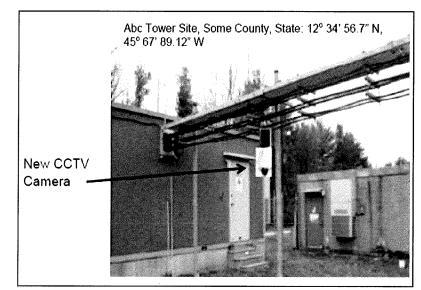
Ground-level photograph with graphic showing proposed equipment installation.
